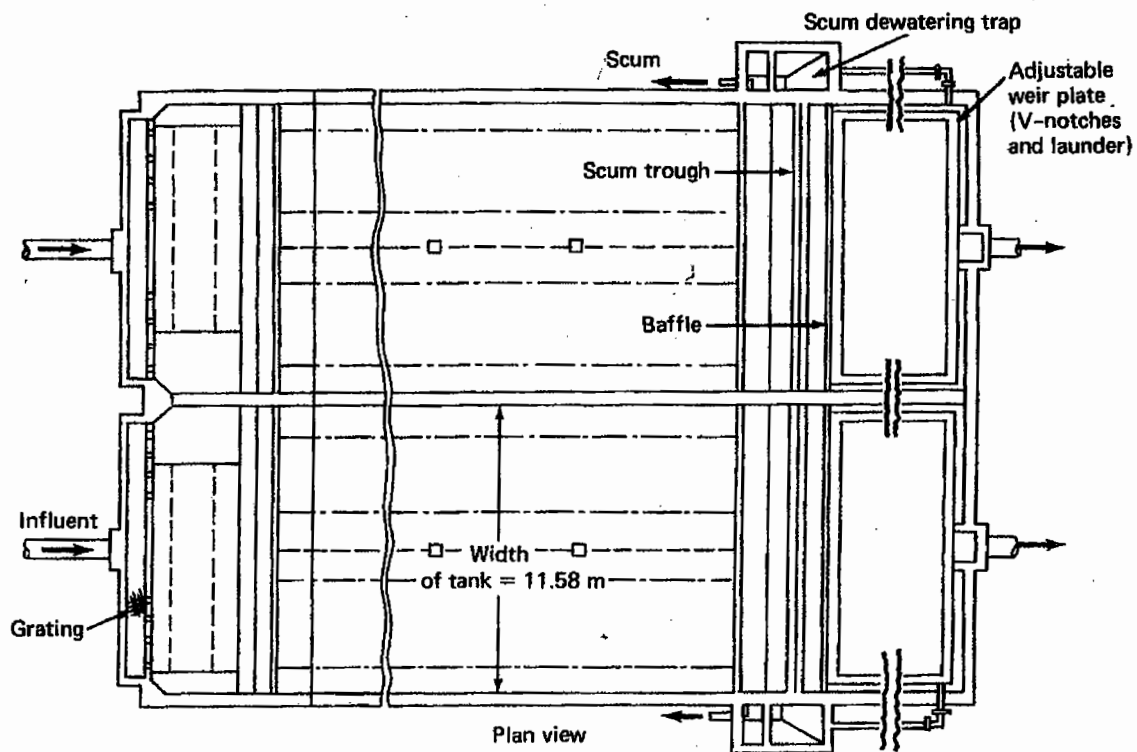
Layout of the Primary Sedimentation Basins in the Design Example (for equipment detail see Figure 12-1).
